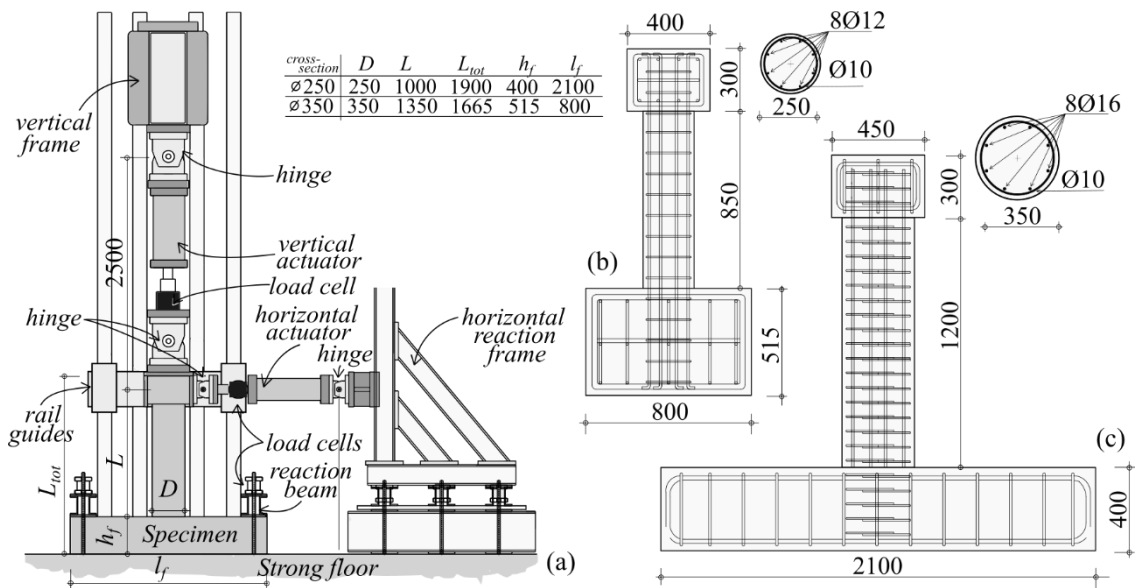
a) Testing arrangement; Specimen geometry and reinforcement setup: b) Medium scale columns, c) Large scale columns.
